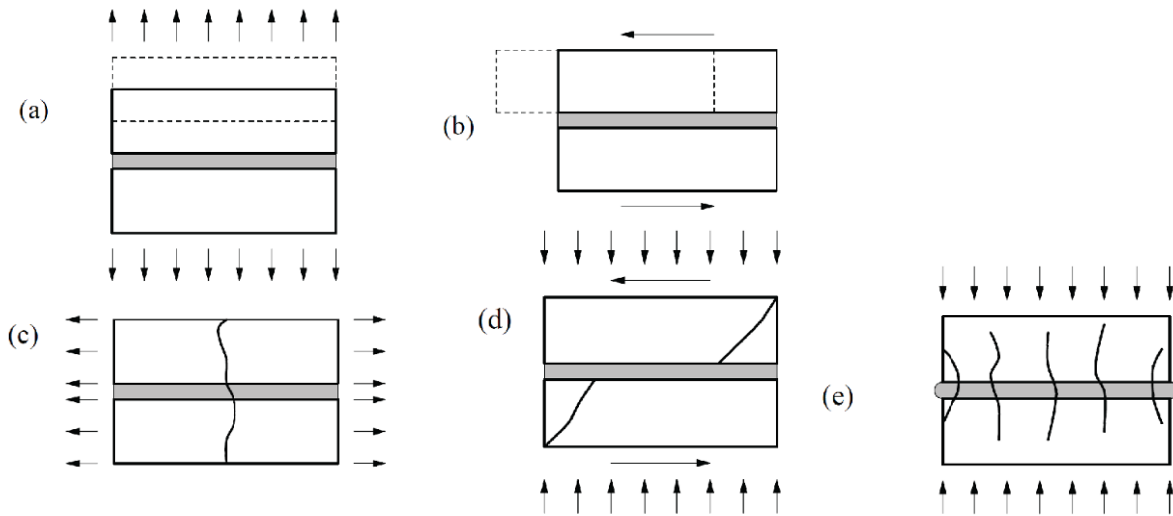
Masonry failure mechanisms: (a) joint tensile cracking; (b) joint slipping; (c) unit direct tensile cracking; (d) unit diagonal tensile cracking; (e) masonry crushing [3].
